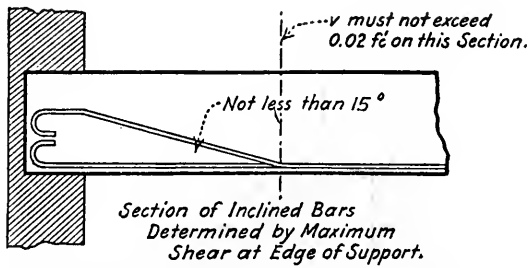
Typical Beam With Web Reinforced by Means of Bars Bent Up in Single Plane
